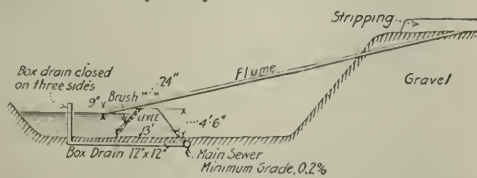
SKETCH OF LAYOUT FOR HYDRAULIC STRIPPING
